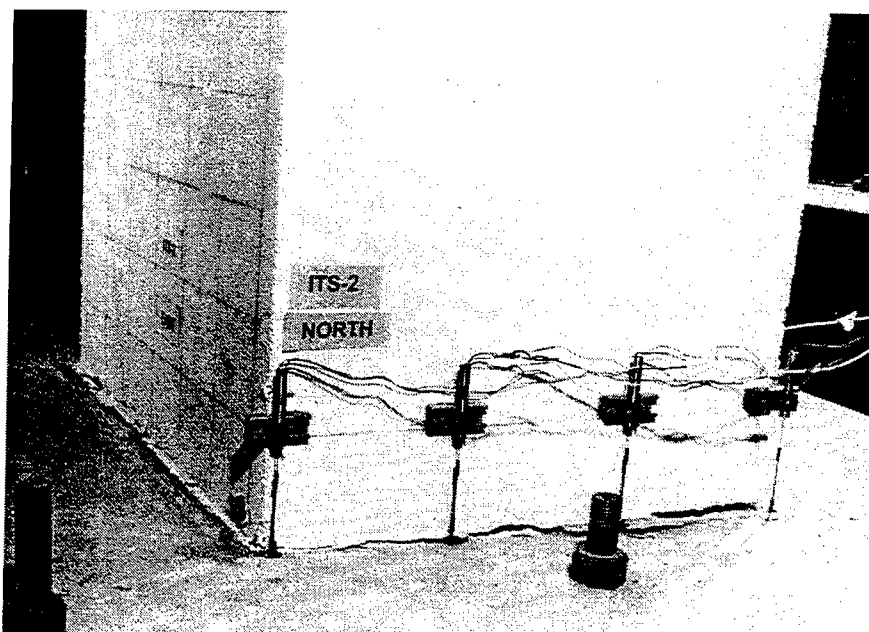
ITS-2 view of north wall, imposed top deflection of 2 in. towards the east.
